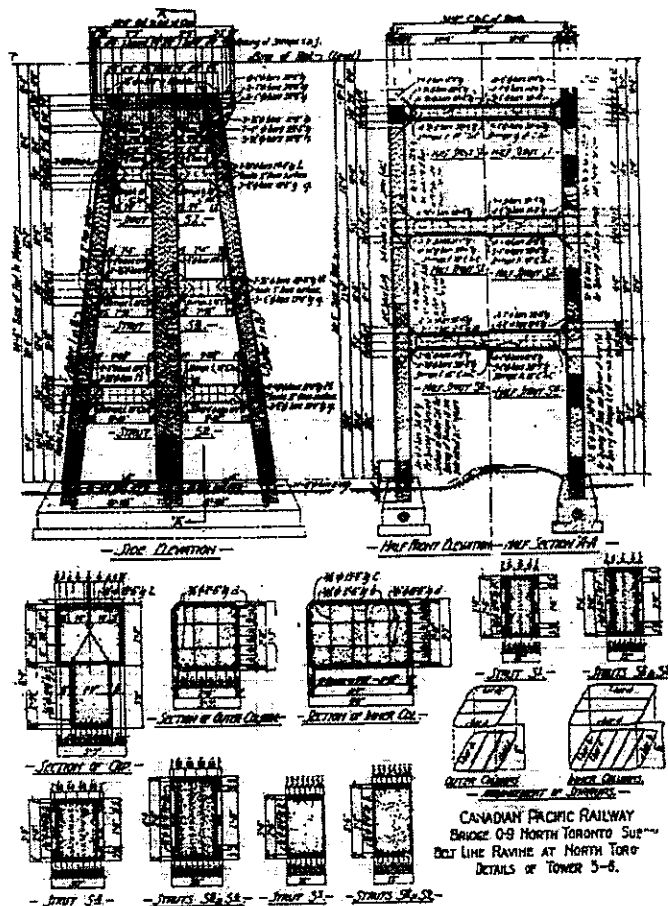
Bridge 0.9, Toronto Belt Line Ry. Bayview, North Toronto Subdivision, C.P.R. Details of tower 3-4
